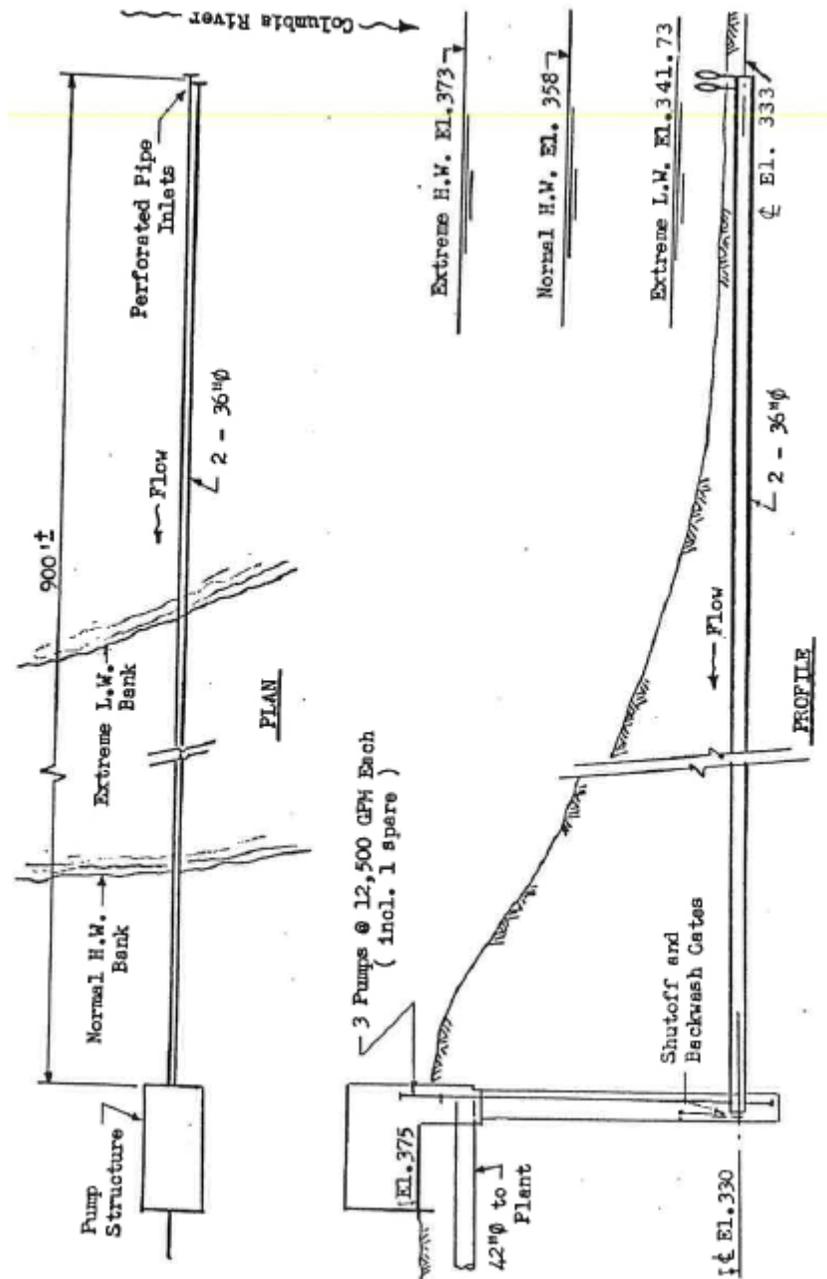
CGS Intake system plan and profile (Coutant 2014)
